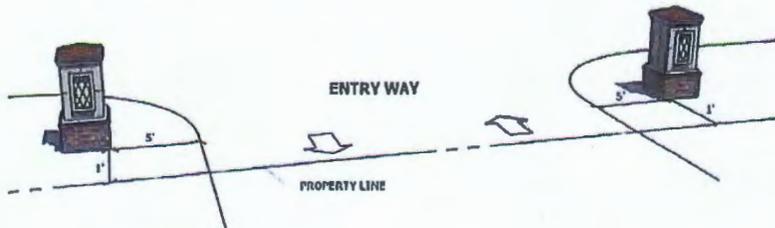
PROPOSED ENTRY COLUMNS (No Signage)
